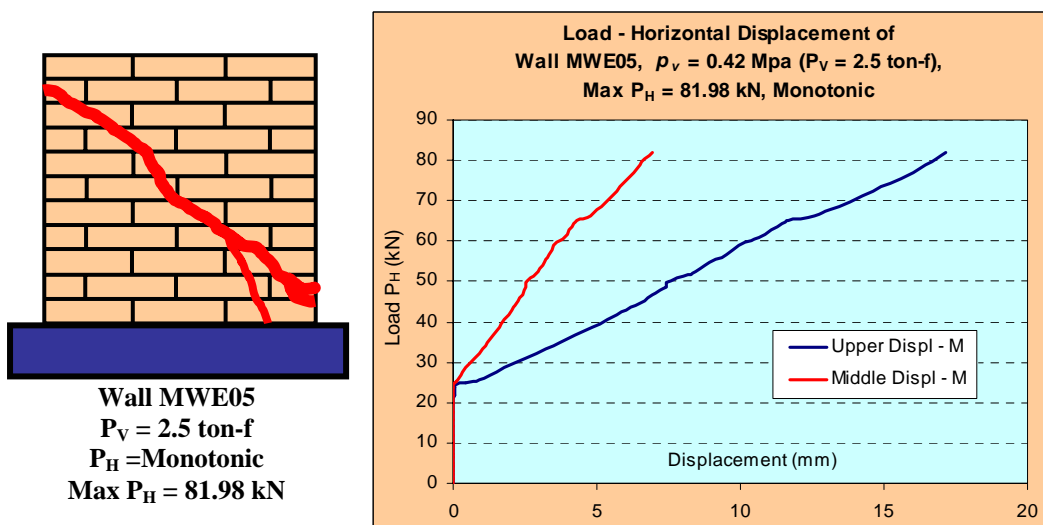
Failure pattern and load-displacement of wall MWE05
